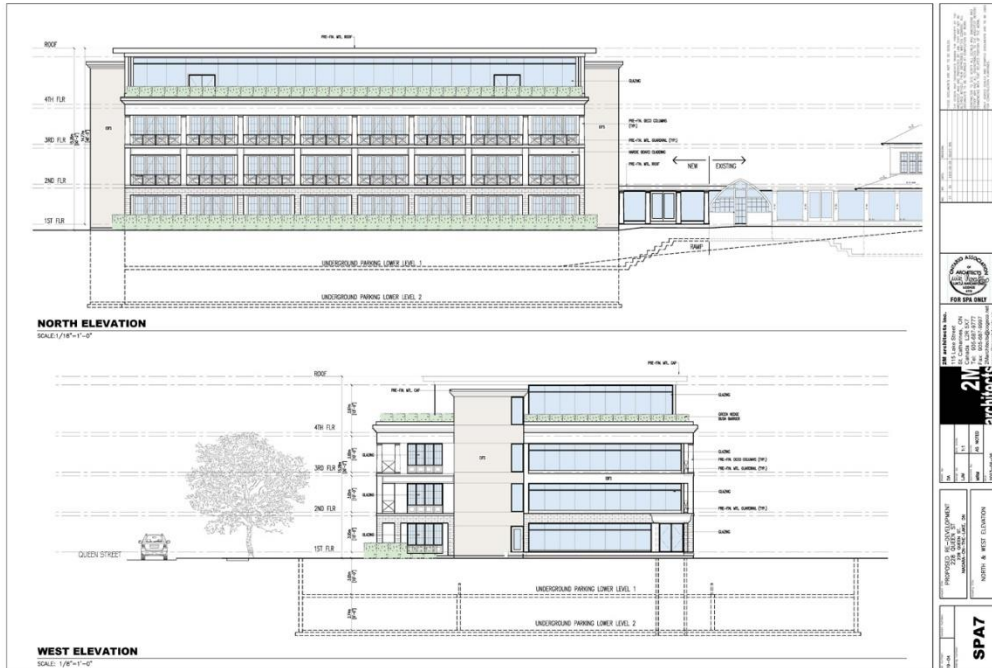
North Elevation of New Building Viewed from Queen Street with Walkway to Existing Greenhouse and West Elevation Looking East from Mississauga Street Direction, 2M Architects (APPENDIX II)
